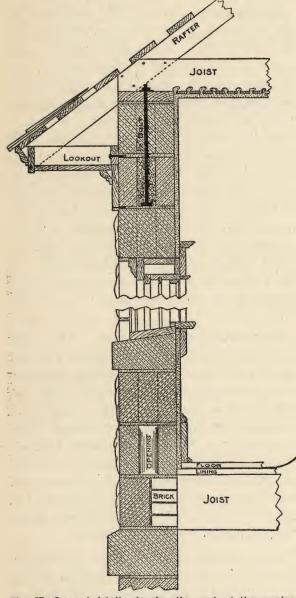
General details showing the work at the cornice and the bolt method of construction.
